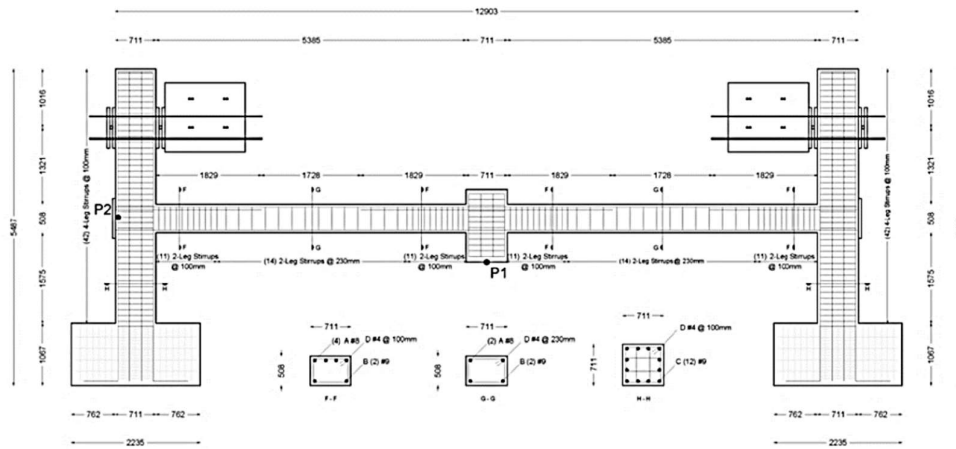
Two-dimensional reinforced concrete frame (Lew et al. [19])
